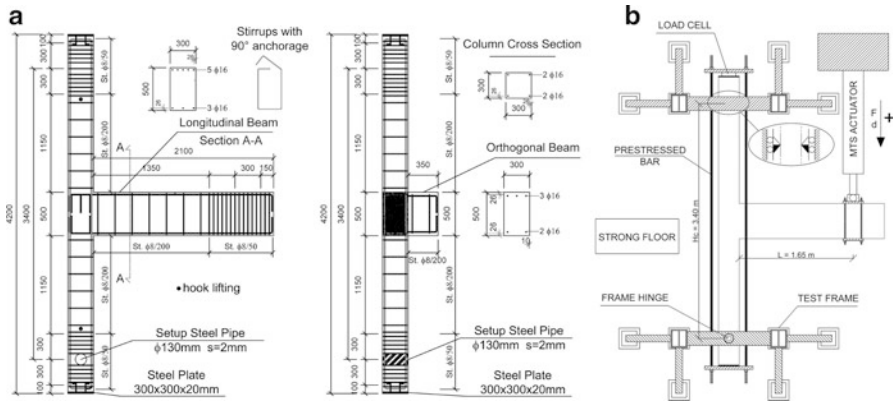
(a) Specimens details; (b) test setup (dimensions in mm)
